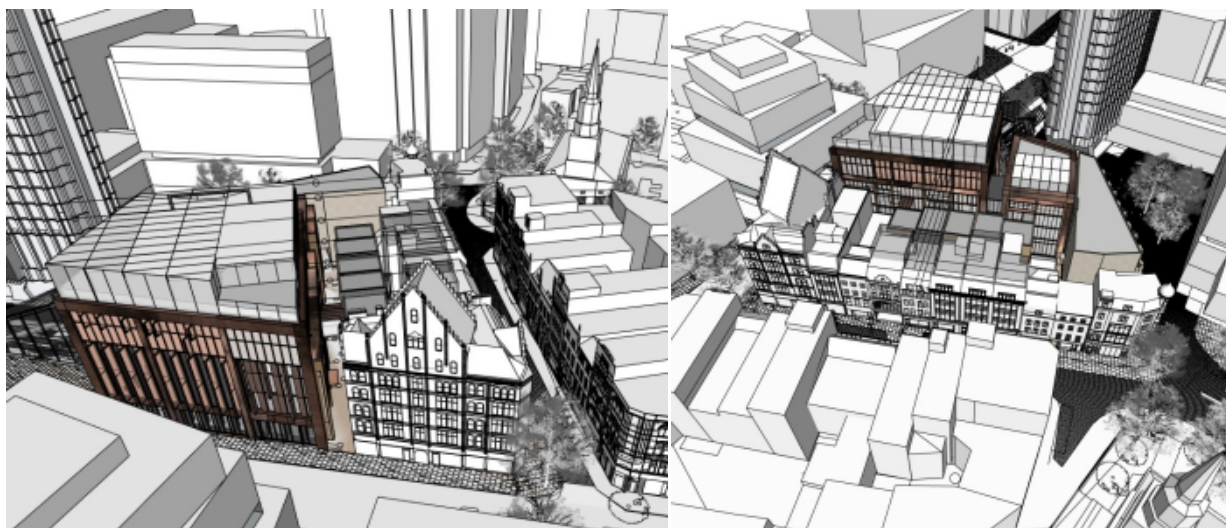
Aerial images showing massing and relationship between new and refurbished buildings (Endell Street not shown)
